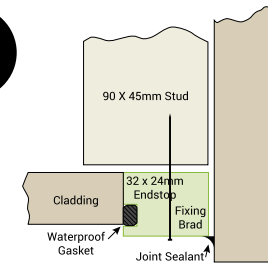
External Cross with Timber Corner (install prior to cladding)
